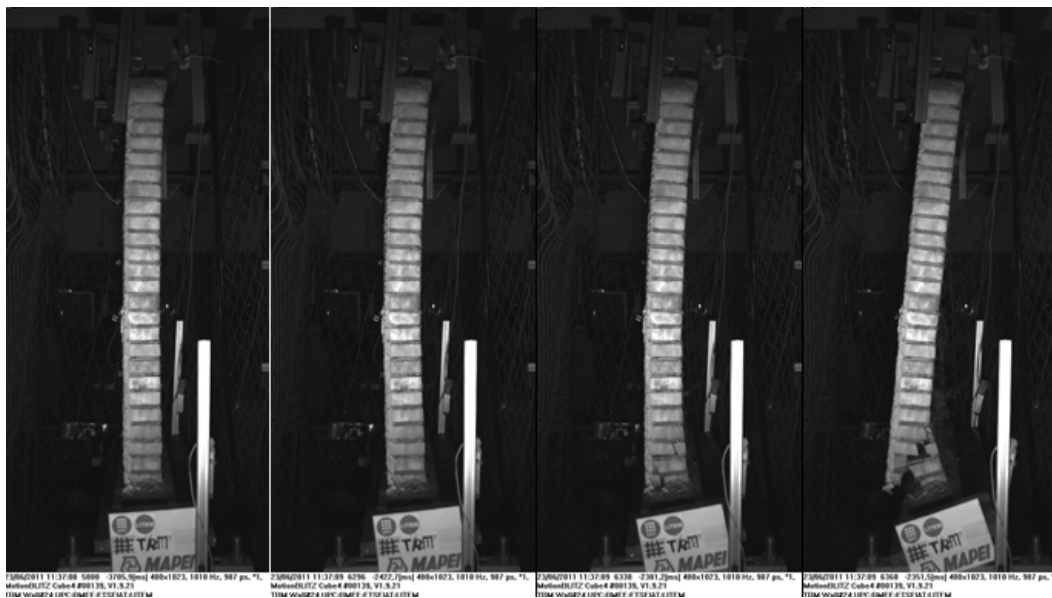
214 Failure of the wall W#24. Masonry failure at wall's bottom.
